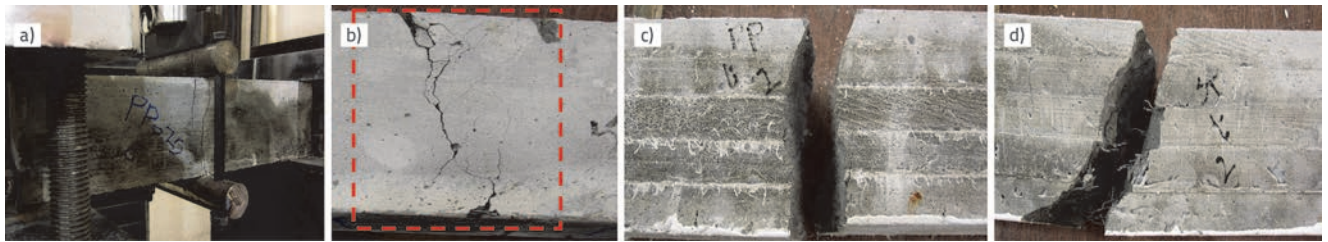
a) Damaged specimen PPO.25 under cyclic loading; b) Multiple cracks formed in reinforced concrete with steel fibres; c) Specimen FGRPP after failure; d) Specimen FGRST after failure
